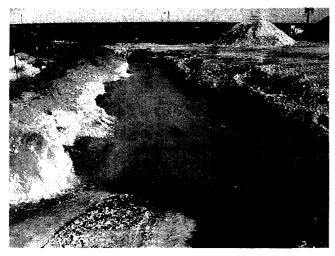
Installation of clay liner in eastern portion of excavation, looking westerly.
